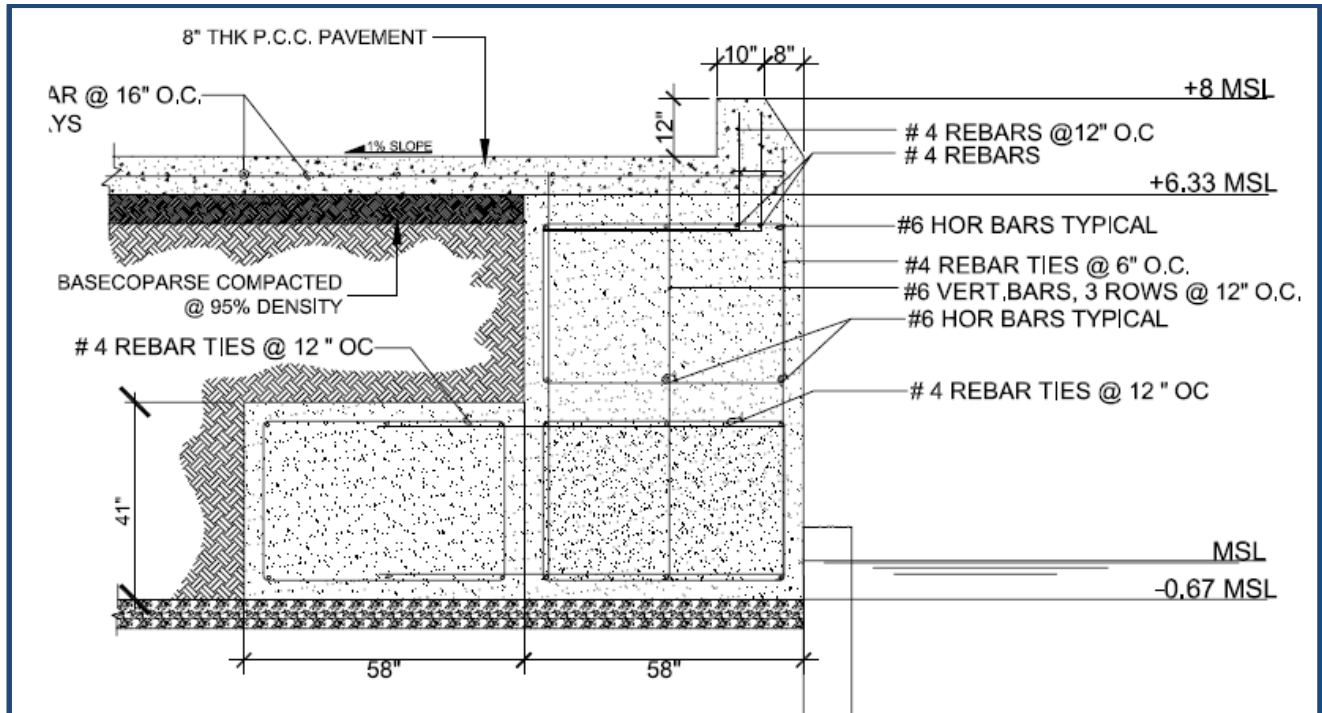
Typical Cross Sectional View Through Berth 4 on North Quay
